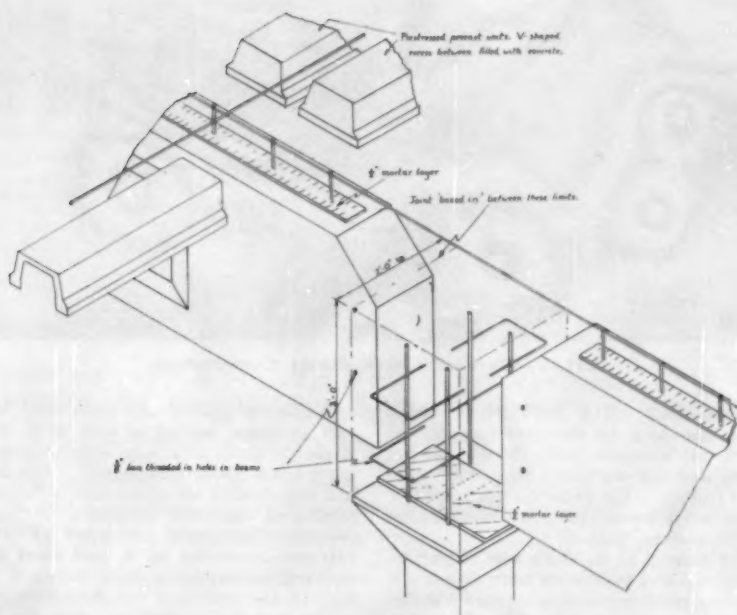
Arrangement of Precast Beams and Roof Units.
